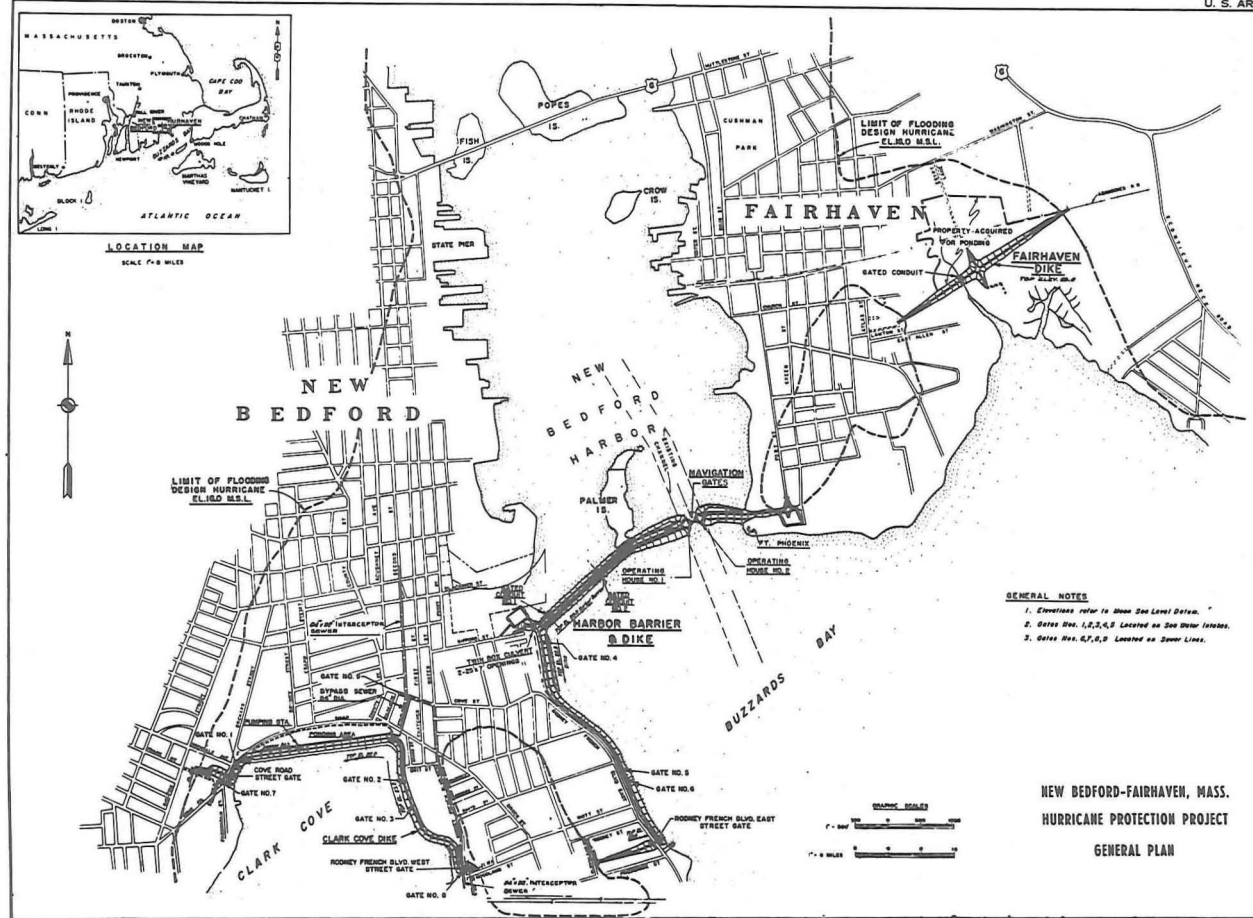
New Bedford-Fairhaven, Mass. Hurricane Protection Project General Plan
